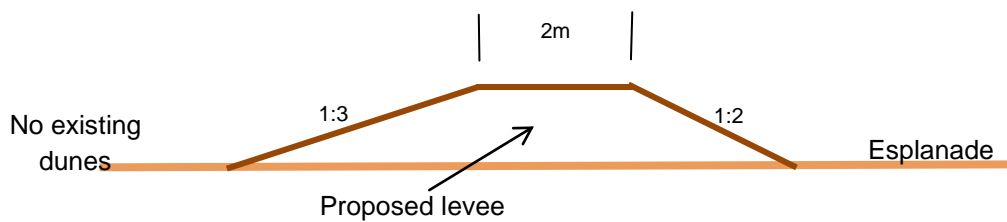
Parham- typical cross section of proposed levee where no sand dunes exist to the sea-side of the proposed levee.
